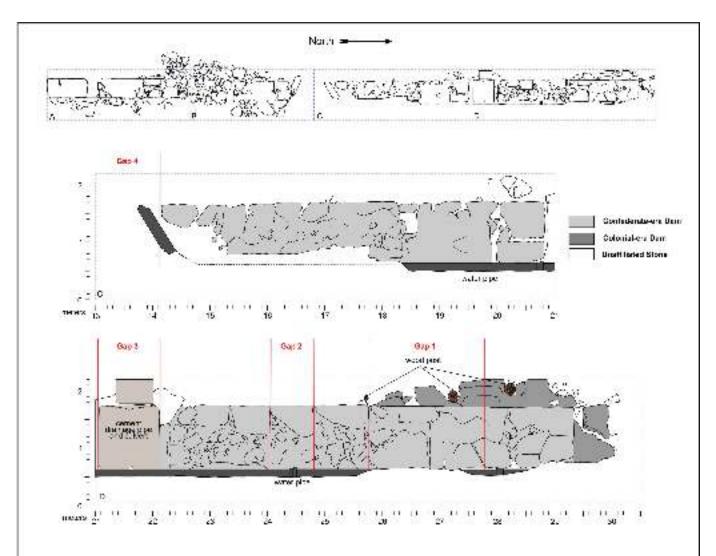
Sequential plan view of north half of Upper Labor Dam showing Gaps 1, 2, 3, and 4.
